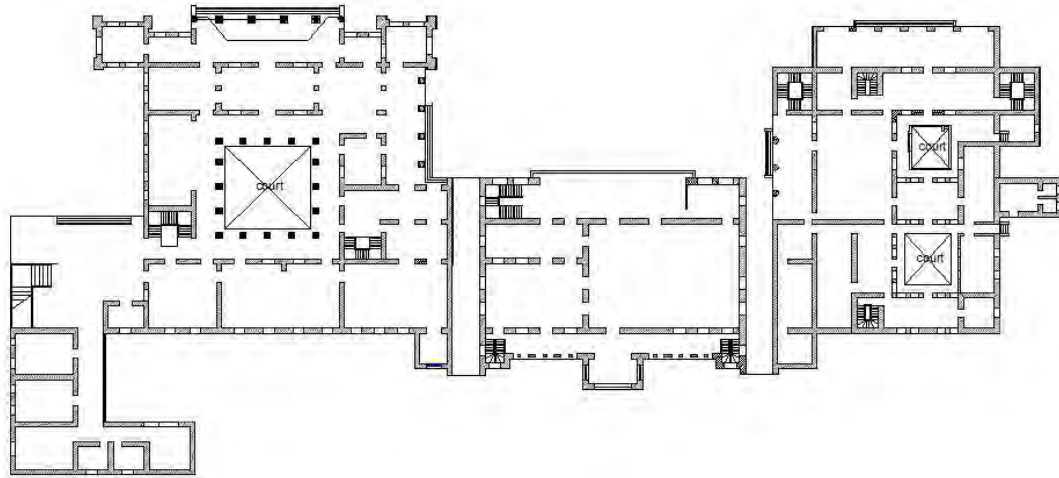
Zamindar Houses, The Compound Plan of Ruplal House
